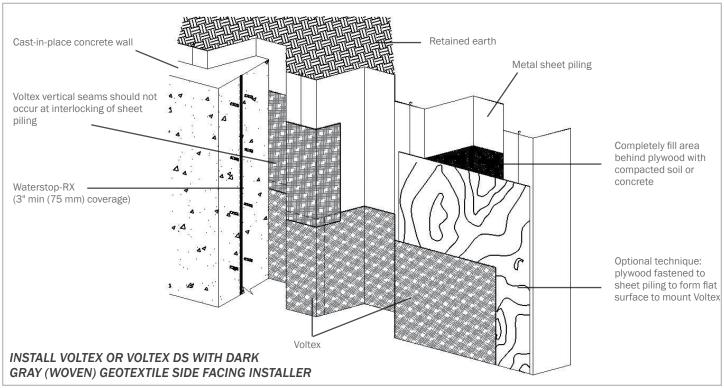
Install Voltex onto metal sheet piling retaining wall with powder-actuated fasteners.
